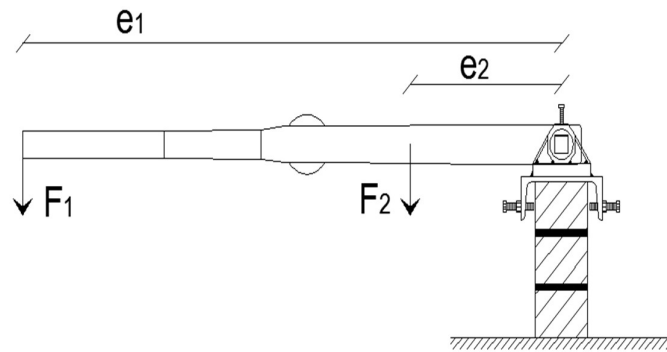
36: Schematic of the test setup adopted for the bond wrench test.
